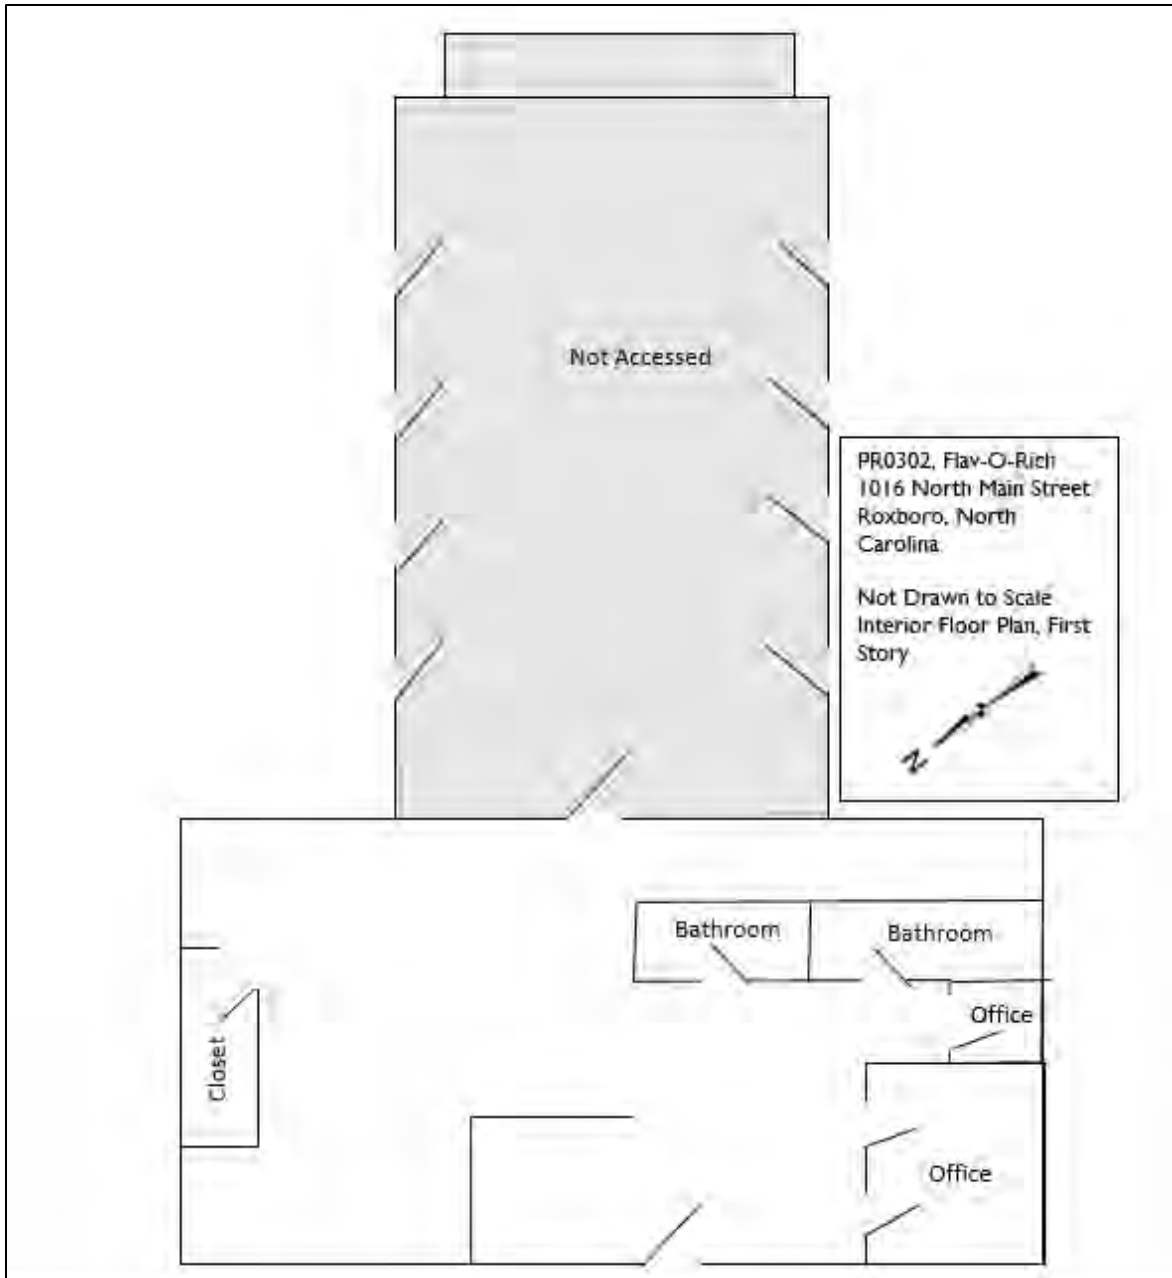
Interior Floor Plan of the Flav-O-Rich Building.
